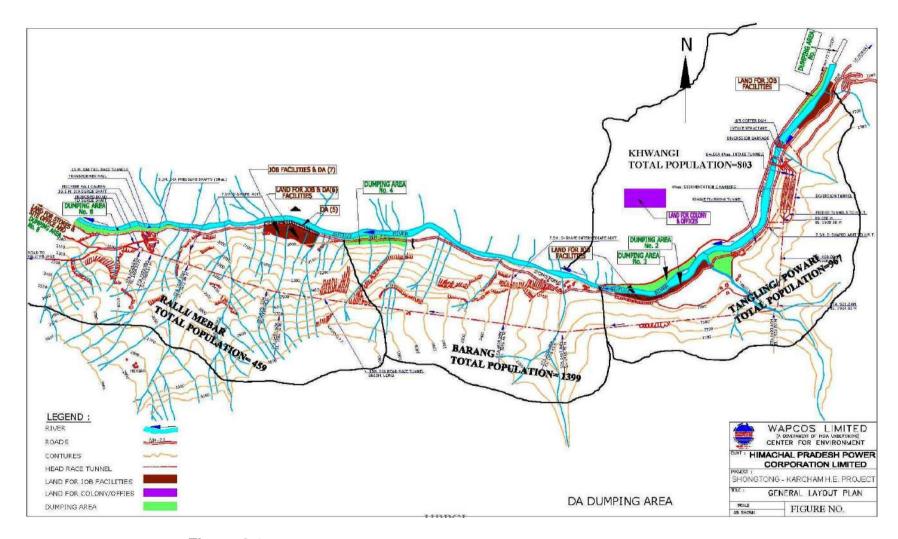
Project location and lay-out plan with village boundary map (Source: HPPCL)
